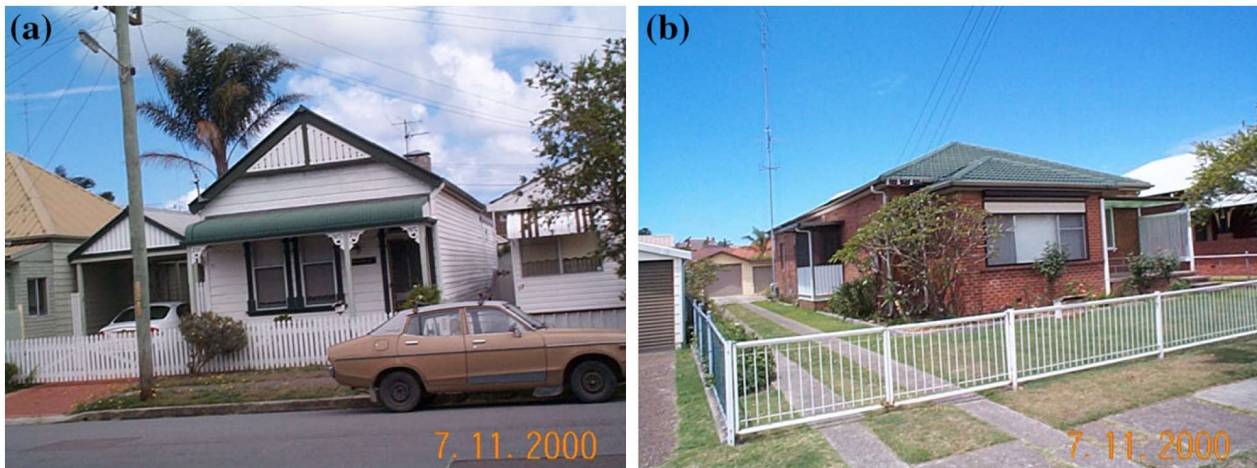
Examples of timber structures: (a) pre-1945 timber frame building, (b) post-1945 timber frame building (brick veneer). From Maqsood et al. (2016).
